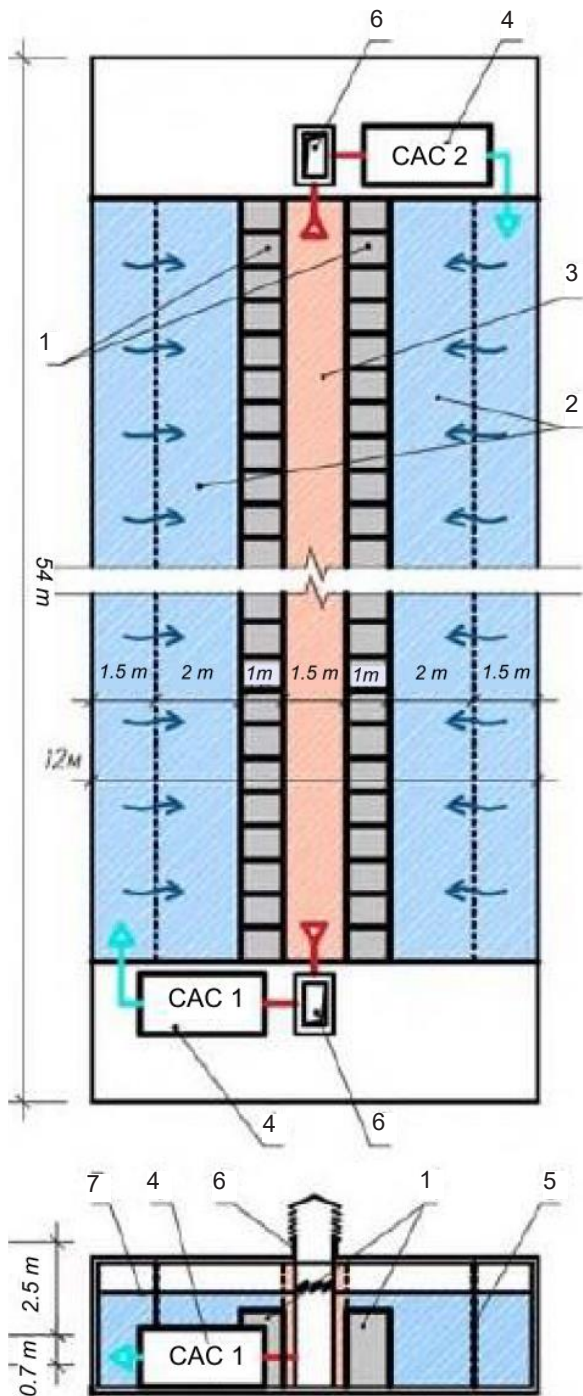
Diagram of a data center air cooling system using central air conditioners: 1 — racks with IT equipment; 2 — cold aisle; 3 — hot aisle; 4 — central air conditioner; 5 — drop separator; 6 — air inlet duct; 7 — suspended ceiling; CAC 1, CAC 2 — central air conditioner
